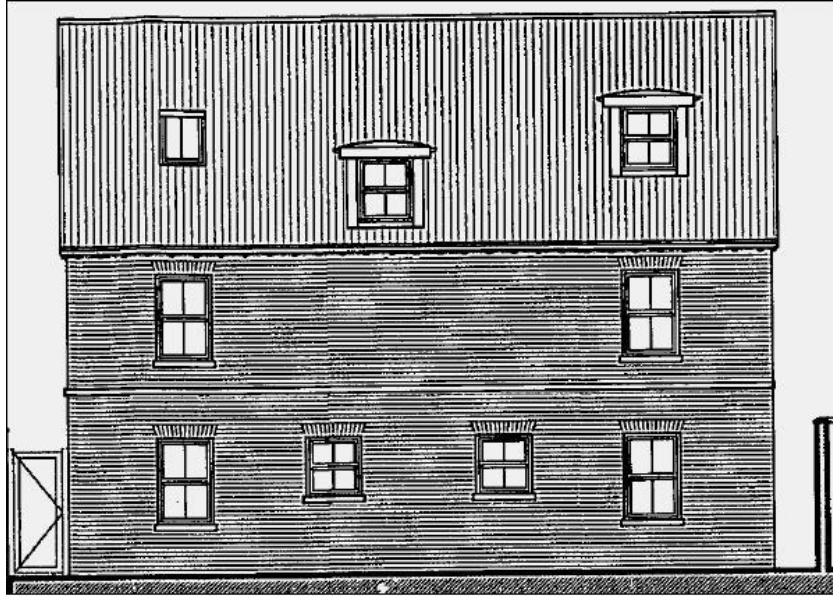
Rear elevation of new building as approved under permission 13/00854/EXT.
